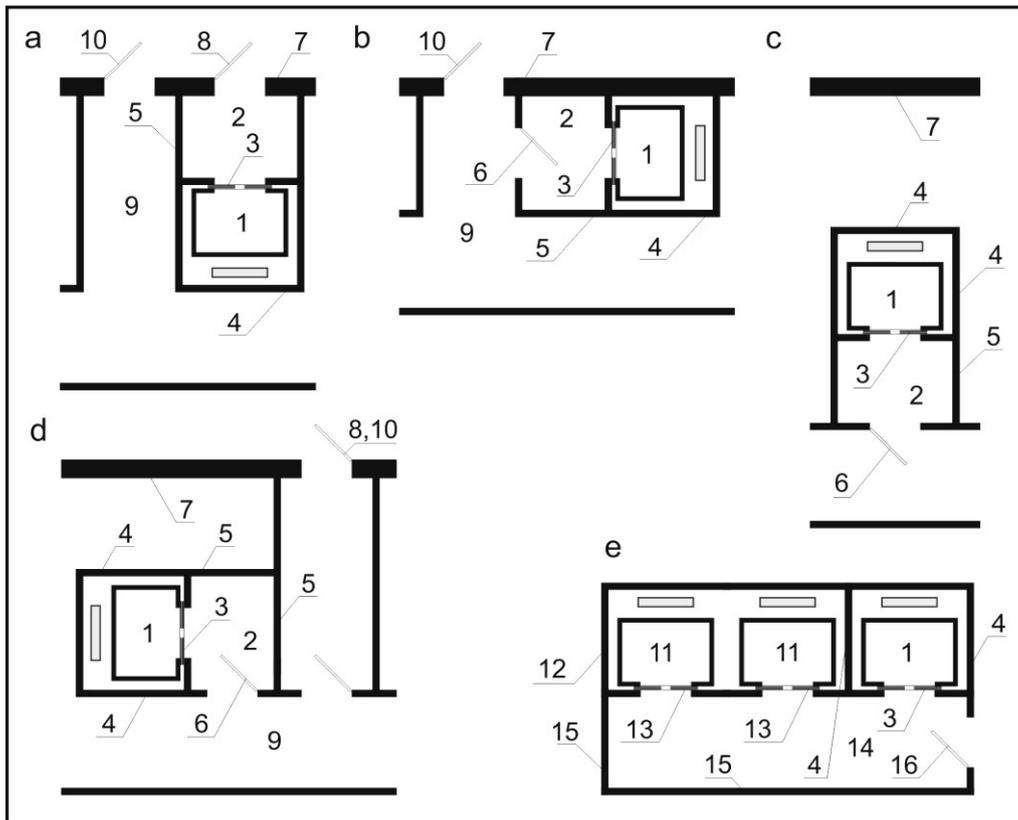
Examples of the fire lift location [25]: a – d – in a separate shaft with an independent lift lobby (a, b – fire lift on the main landing floor near the outer wall of the building; c – fire lift inside the building on the main landing floor; d – fire lift on other floors inside the building); e – in a separate shaft with a common lift hall with other lifts; 1 – fire lift; 2 – lift lobby of the fire lift; 3 – fire doors of the 1st type of the lift shaft of the fire lift; 4 – enclosing structures of the lift shaft of the fire lift; 5 – enclosing structures of the lift lobby of the fire lift; 6 – fire doors of the 2nd type of the lift lobby of the fire lift; 7 – external wall of the building; 8 – entrance from the outside to the fire lift; 9 – section of the evacuation route (corridor, hall, foyer, lobby, etc.); 10 – entrance to the building; 11 – other lifts; 12 – enclosing structures of lift shafts of other lifts with fire resistance classes established by relevant regulatory documents; 13 – fire doors of the 2nd type of lift shafts of other lifts; 14 – common lift lobby; 15 – enclosing structures of the common lift lobby of the fire lift; 16 – fire doors of the 2nd type of the common lift lobby of the fire lift
